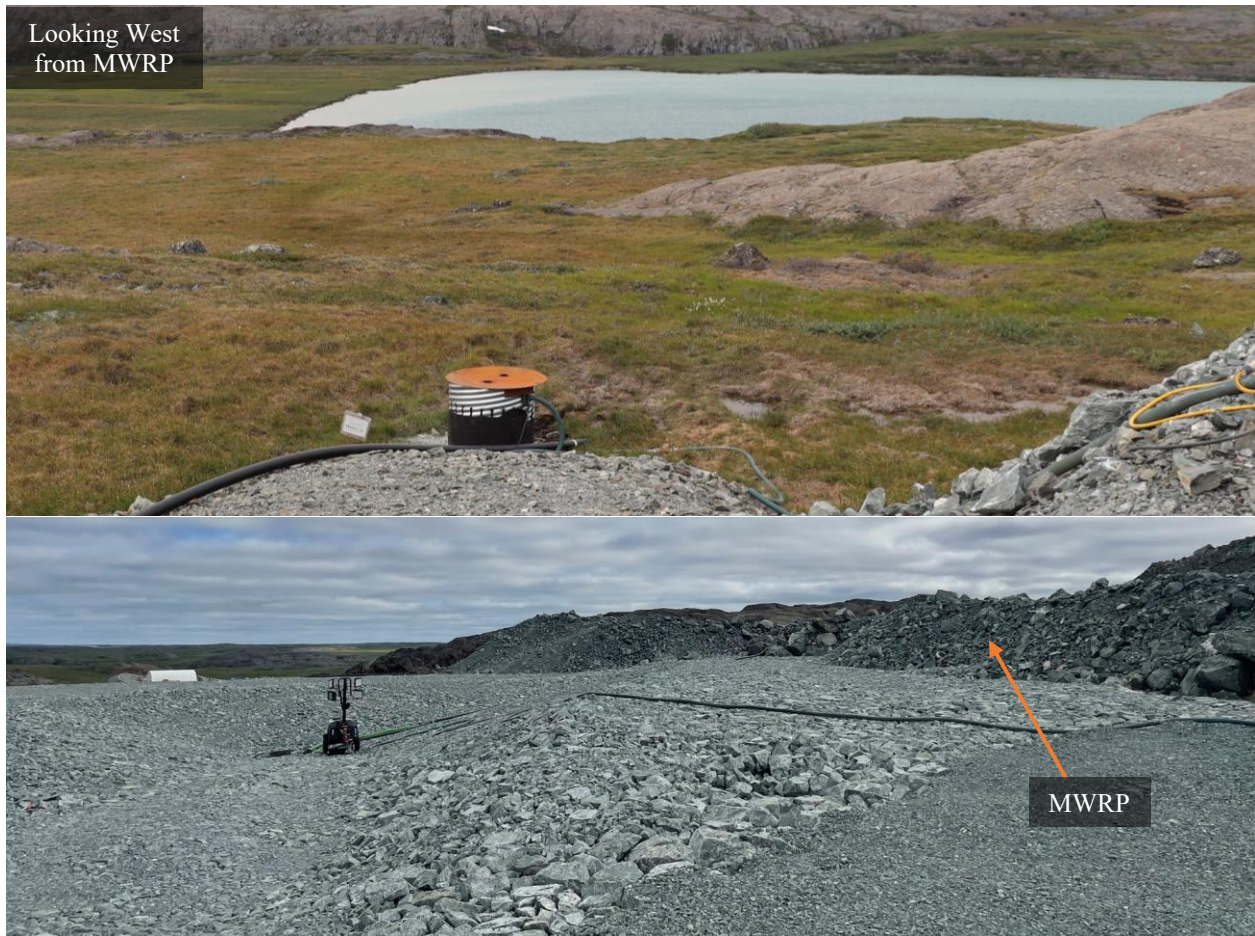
Two of four Stormwater management sumps around the Madrid Waste Rock Pile (MWRP)
